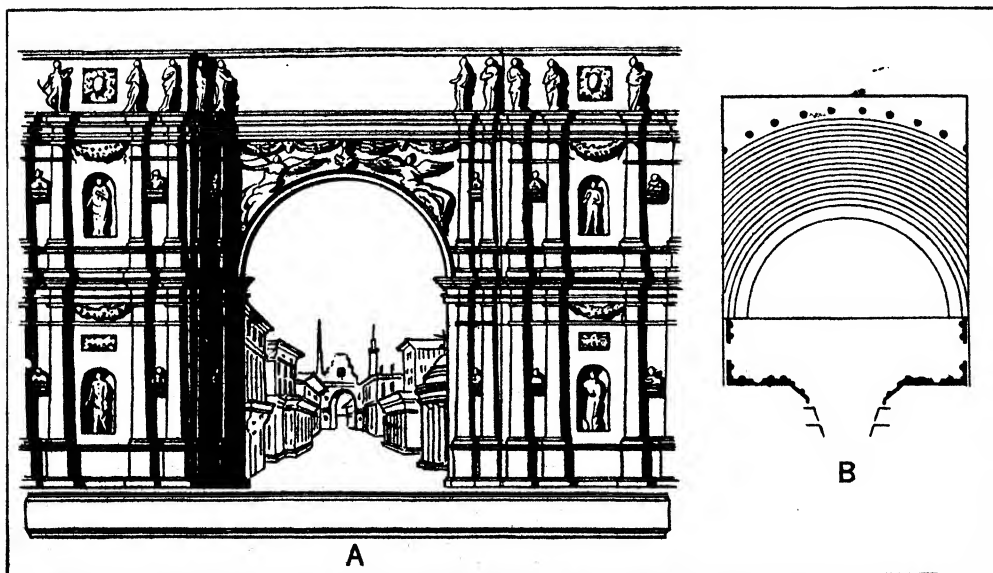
PLAN AND ELEVATION BY INIGO JONES OF A WIDENED CENTRAL "VISTA," DESIGNED NOT ONLY TO GIVE A PICTORIAL BACKGROUND BUT TO PROVIDE ACTING SPACE WITHIN THE "VISTA"
